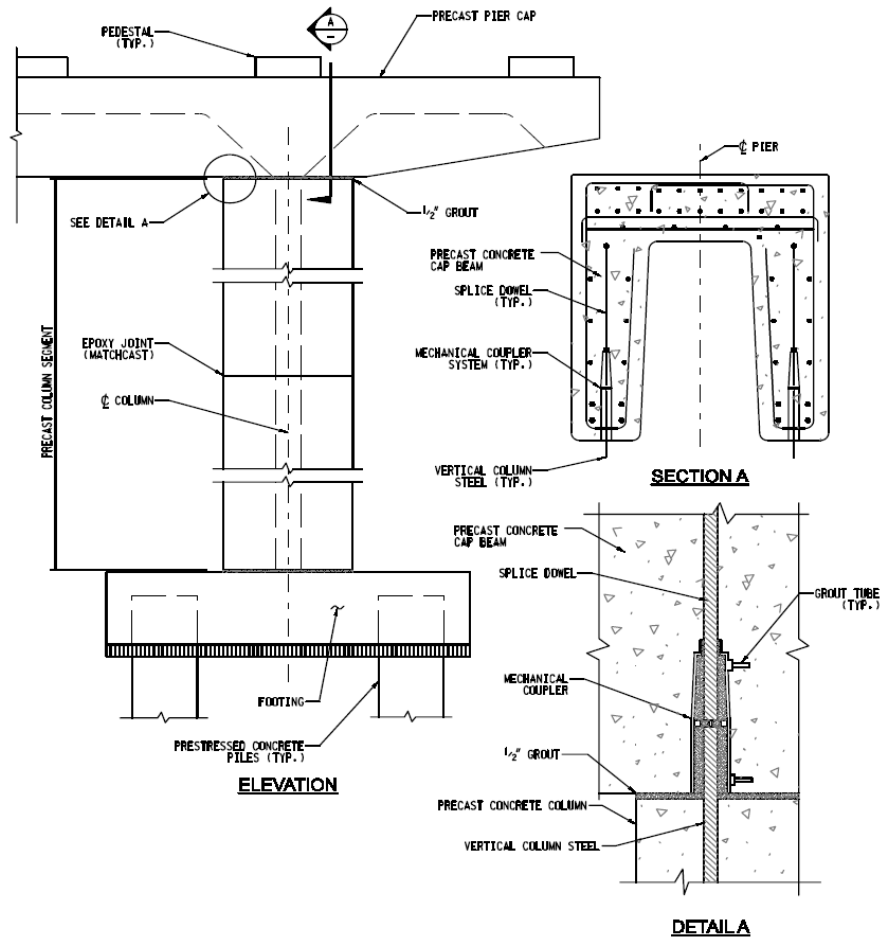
Edison Bridge, Florida DOT (Culmo 2009).
